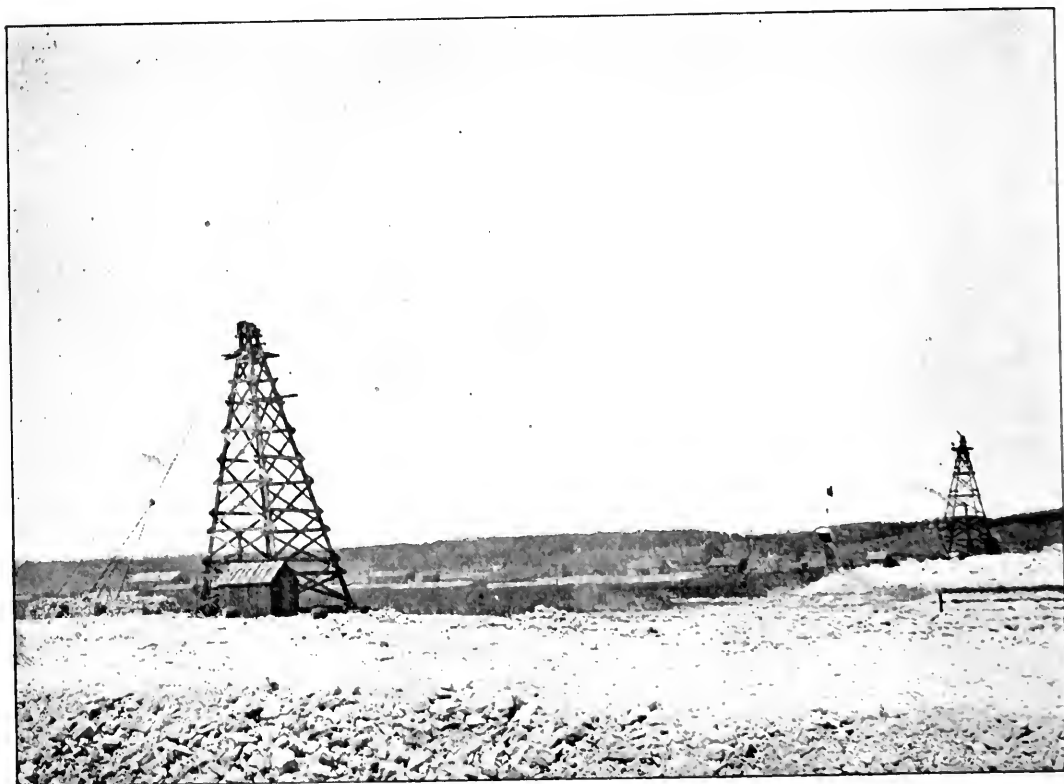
GENERAL VIEW OF CABLE HOIST CONVEYOR—SHOWING SKIP BEING DUMPED BY USE OF AERIAL DUMP.
